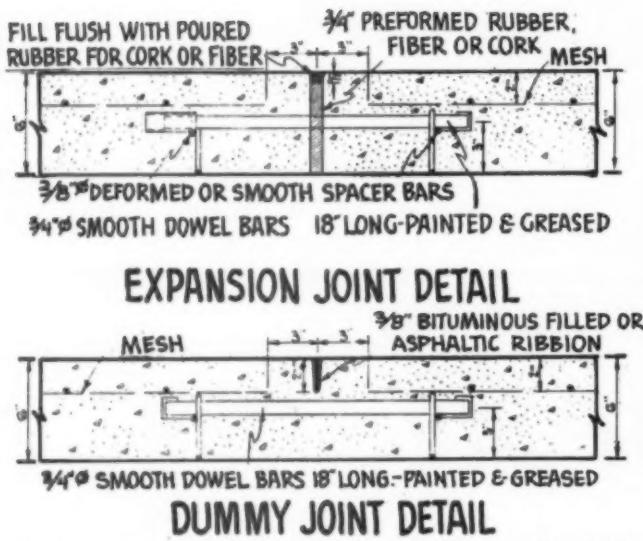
Transverse Expansion Joint and Dummy Contraction Joint Details. Longitudinal Joints Are Practically Identical, Differing Only in Length of Sleeve Over Dowel. Hinged Joints Show in Fig. 8 Are Merely Dummy Joints Over Continuous Reinforcing
